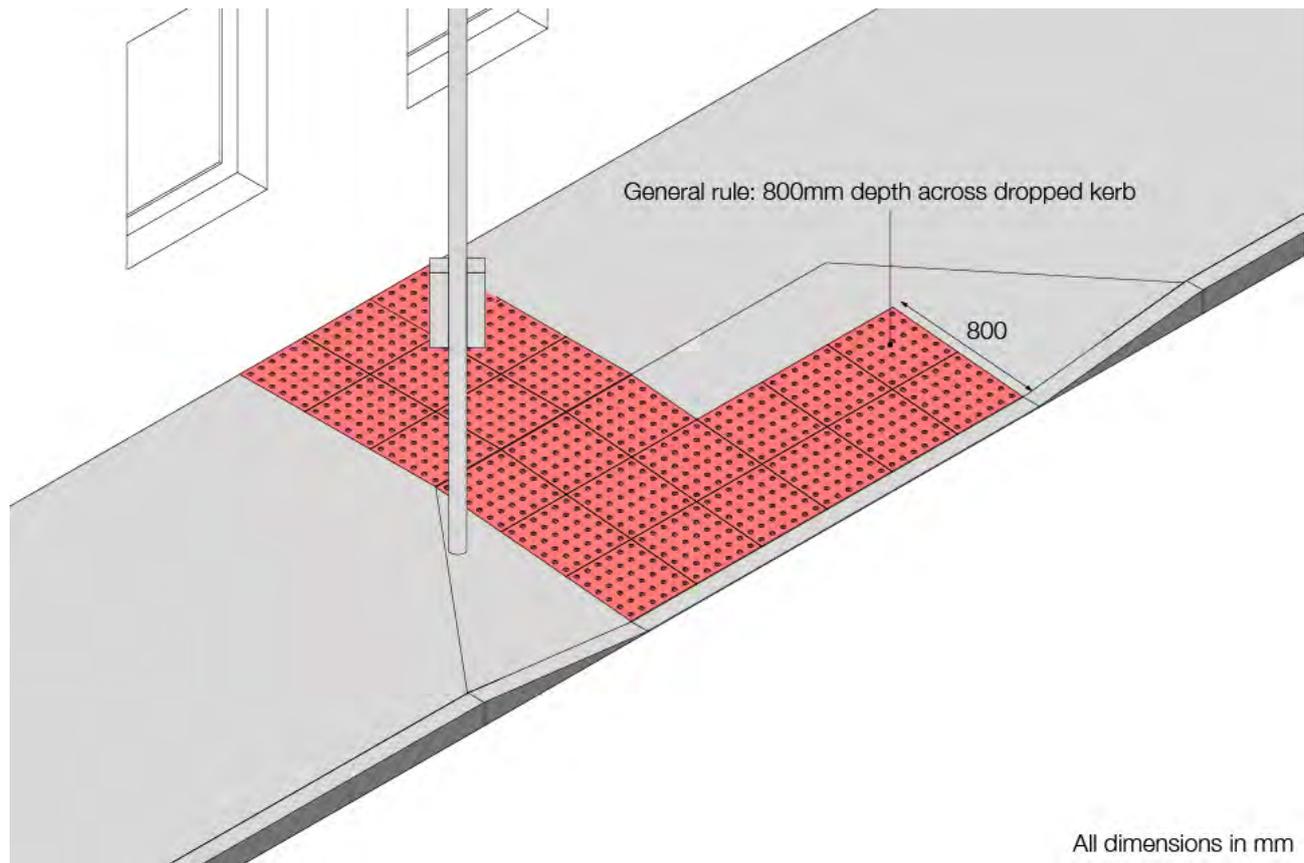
B: Layout of the blister surface at an in-line controlled crossing point
